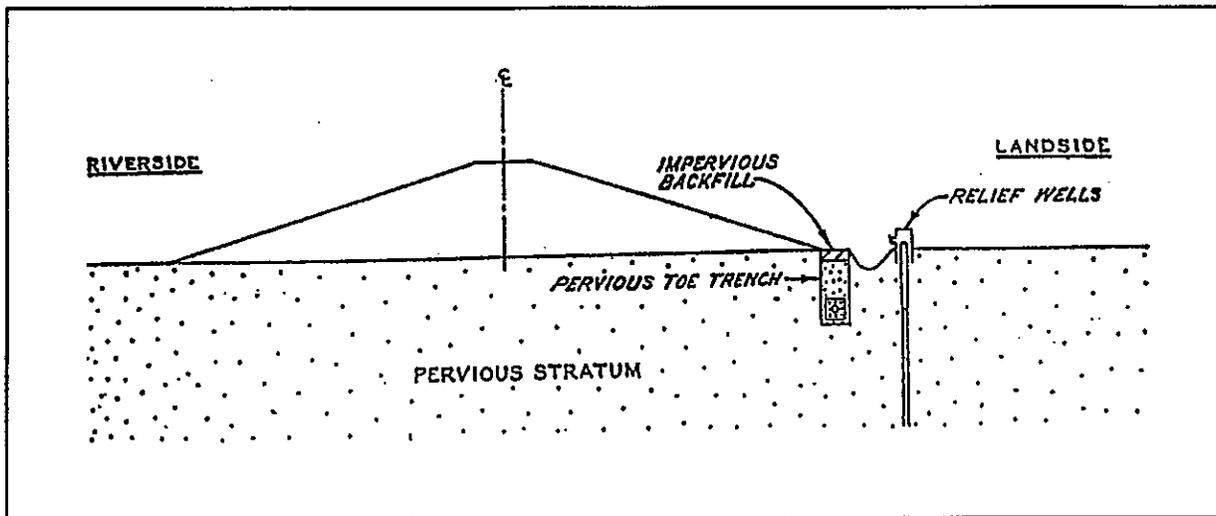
Typical pervious toe trench with collector pipe (Figure 5-6 shows trench details)
